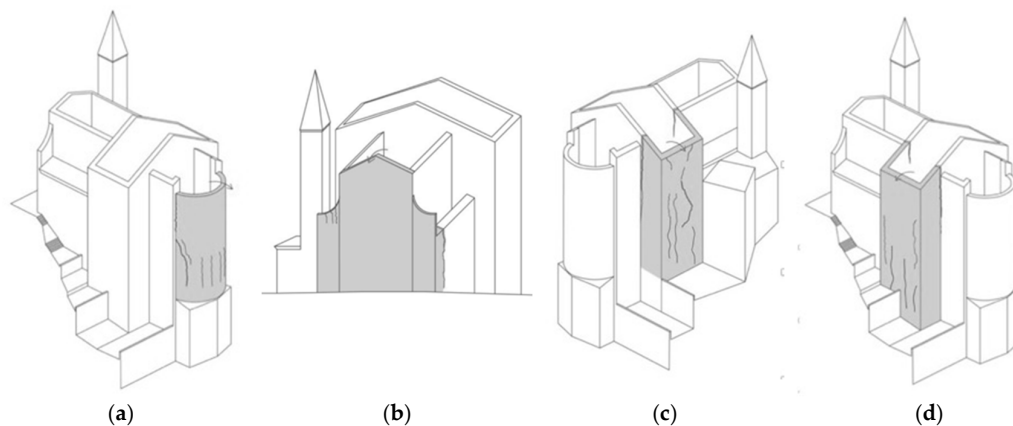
Cracking pattern and identification of macroelements: (a) apse, (b) façade, (c) east transept and (d) west transept.
